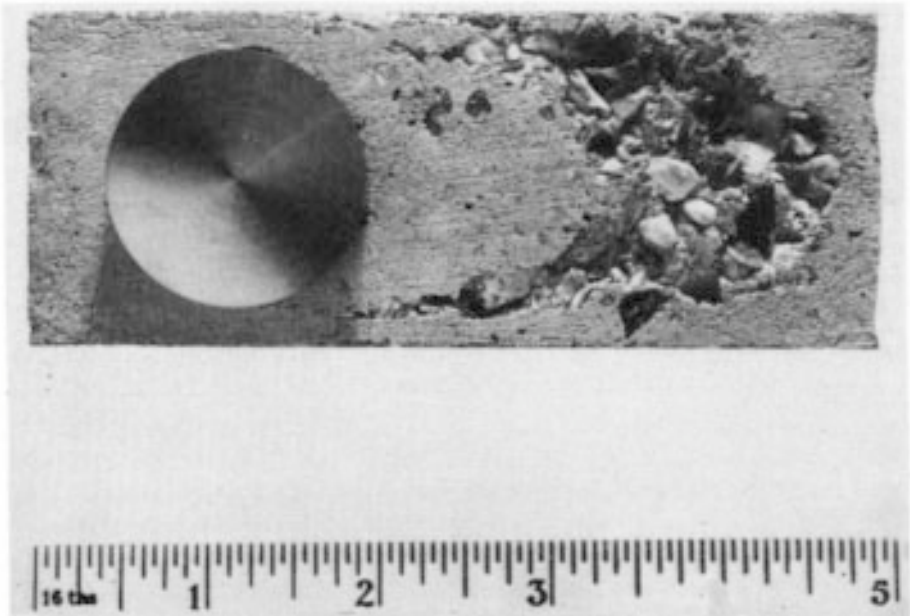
Damage to concrete by cavitation in test rig. Courtesy, M.J.Kenn, Imperial College, London.
